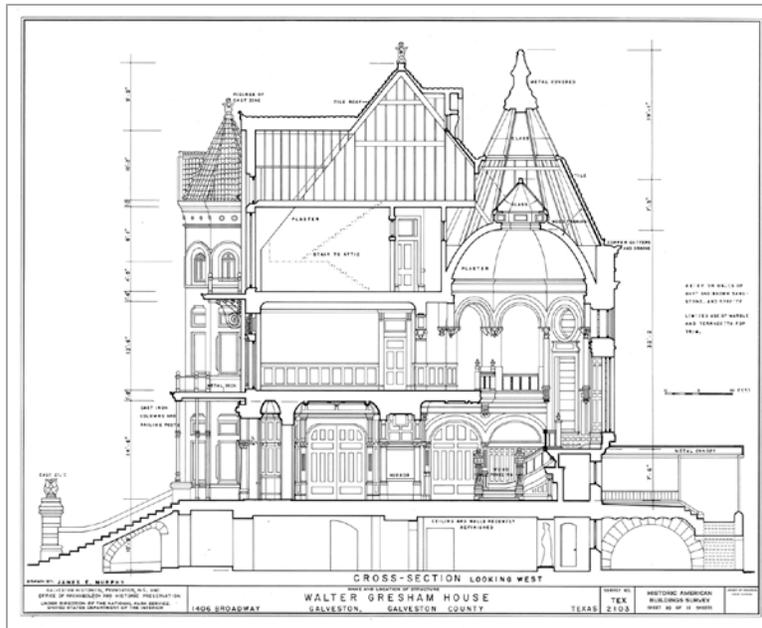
Nicholas J. Clayton’s Gresham House (now called Bishop’s Palace) Historic American Building Survey drawing
